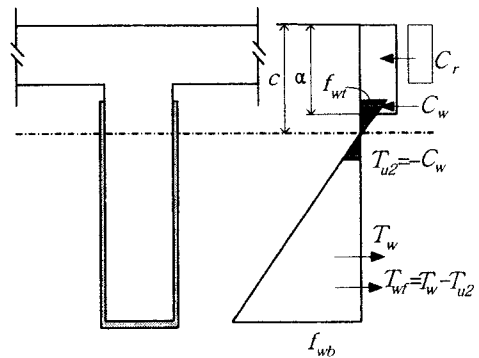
Force equilibrium in a composite panel section : neutral axis below flange and top fiber sheets
